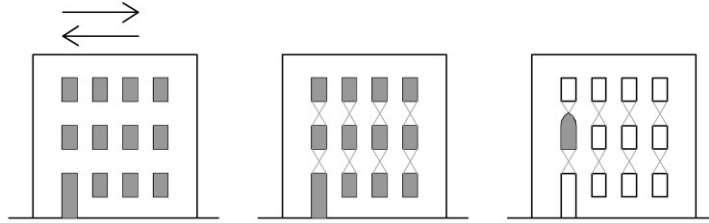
Horizontal shear stressed wall, cracking pattern, lintel collapse generating pointed arch profile (Author's drawing, 2014)
